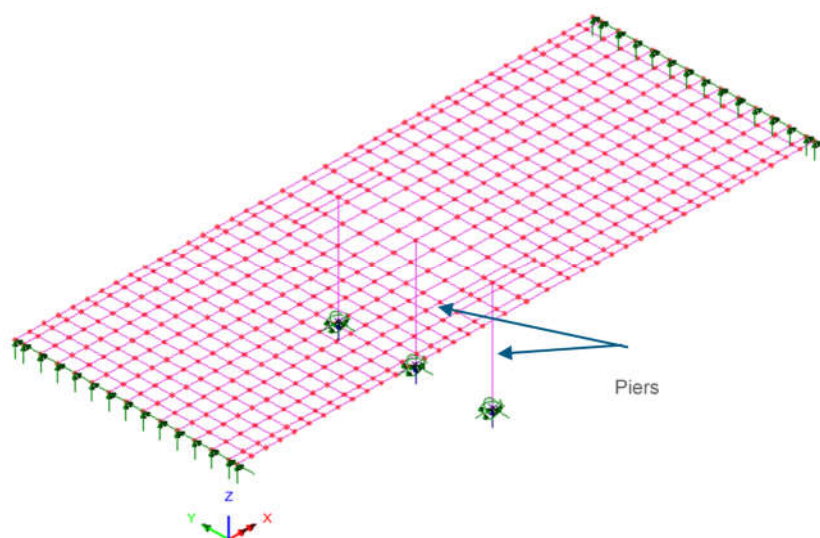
Pitmore Bridge Idealisation – Isometric view
